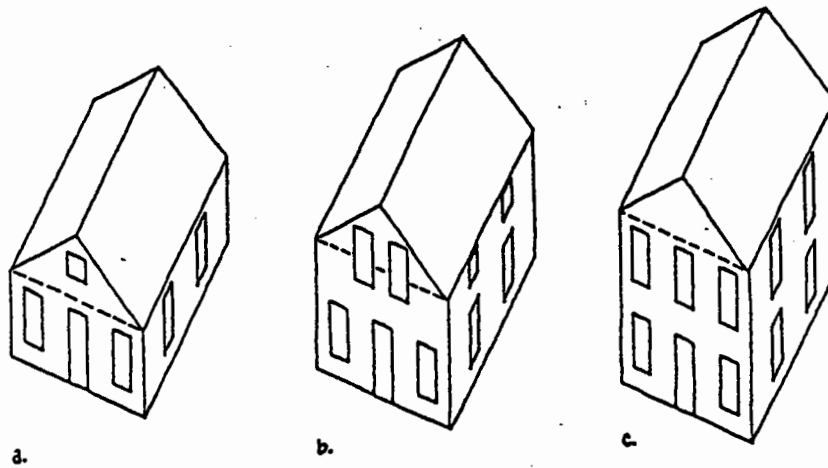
Wall height guidelines illustrated, note the eave line: a) one story, b) one-and-one-half story, c) two story (after Murphy).
